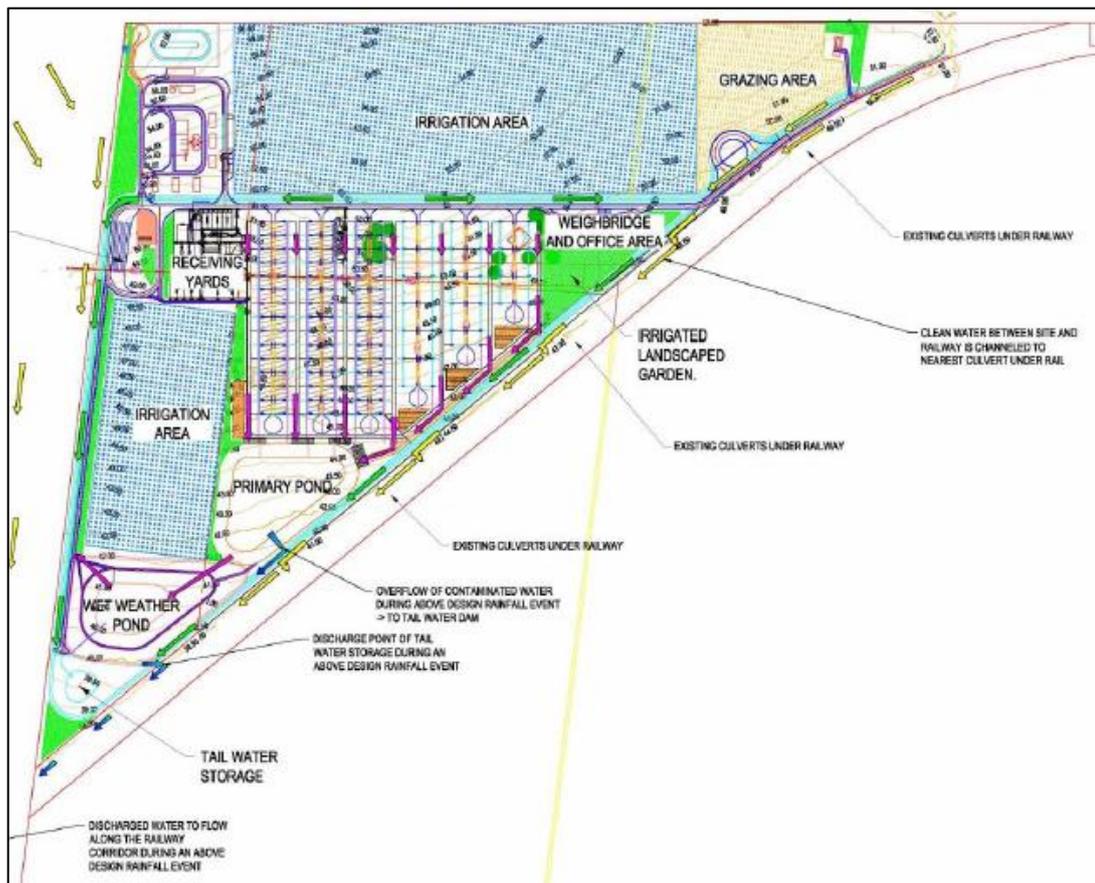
Surface water site plan – stage1 & 2 (source: Surface Water Management Plan)
